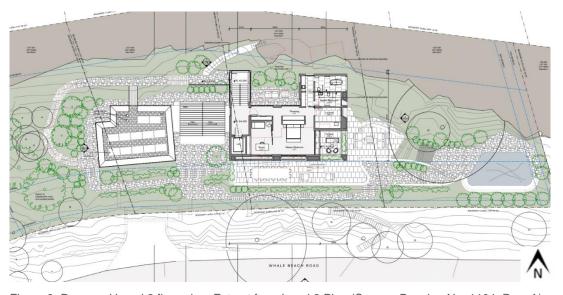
Proposed Level 2 floor plan, Extract from Level 2 Plan (Source: Drawing No. 1104, Rev. A)
